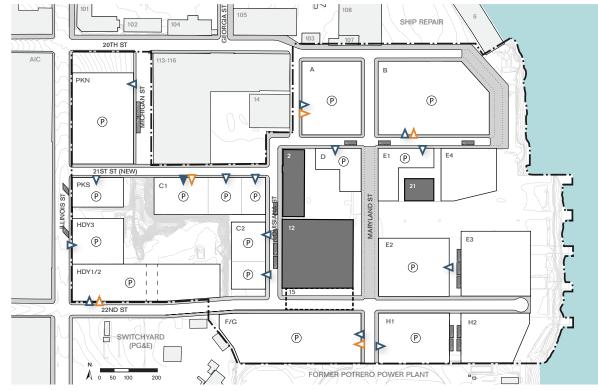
Illustrative Plan of Loading and Parking Access
